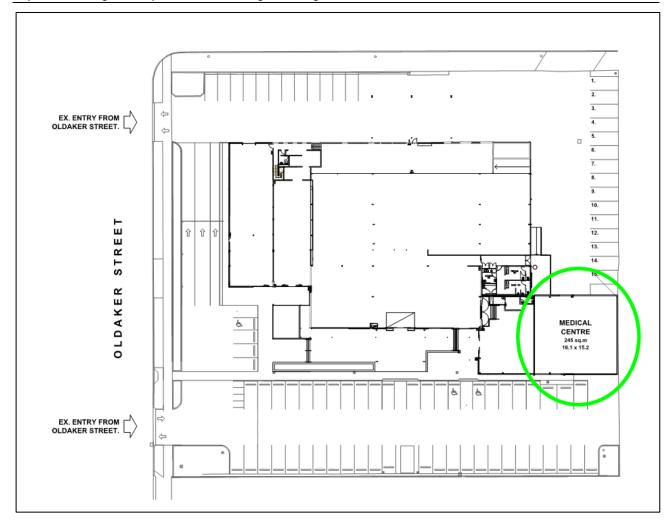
Site Plan submitted by applicant with location of proposed medical centre circled in green
